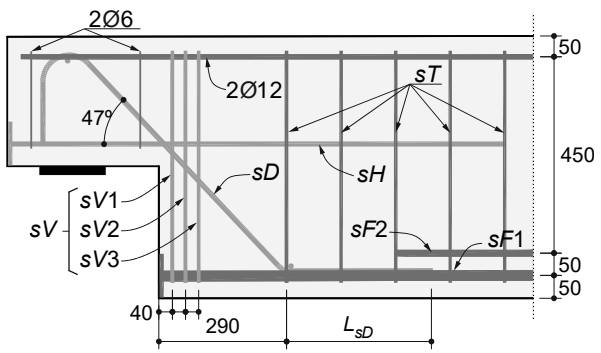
Reinforcement notation and geometry (main reinforcement of the dapped-end in light grey; dimensions in mm).
